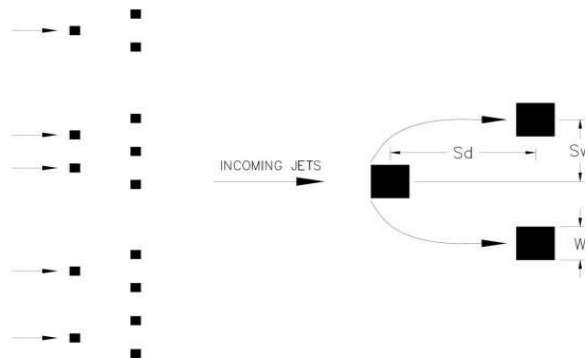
Typical Baffle Block Arrangement and Spacing for Single or Double Outlet Jets
